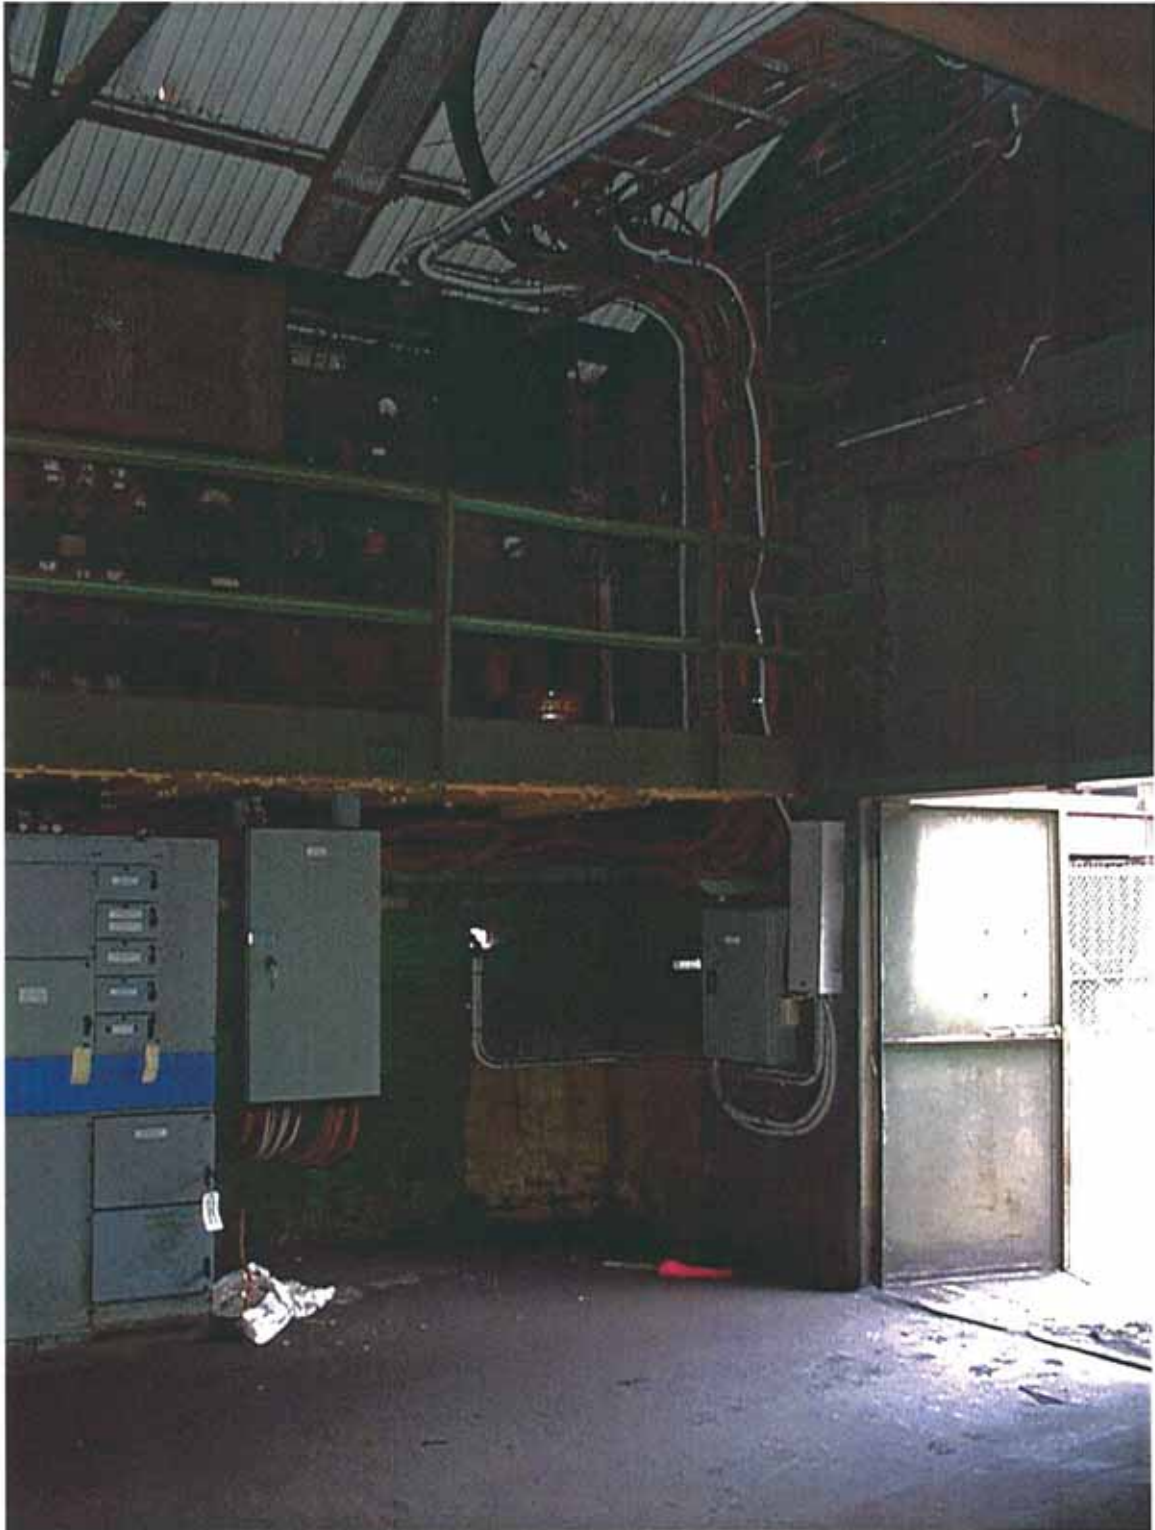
View - East of Tar Pump House in Open Hearth Bath House. Shows access doors to East wall and electrical panels and breaker board above.
